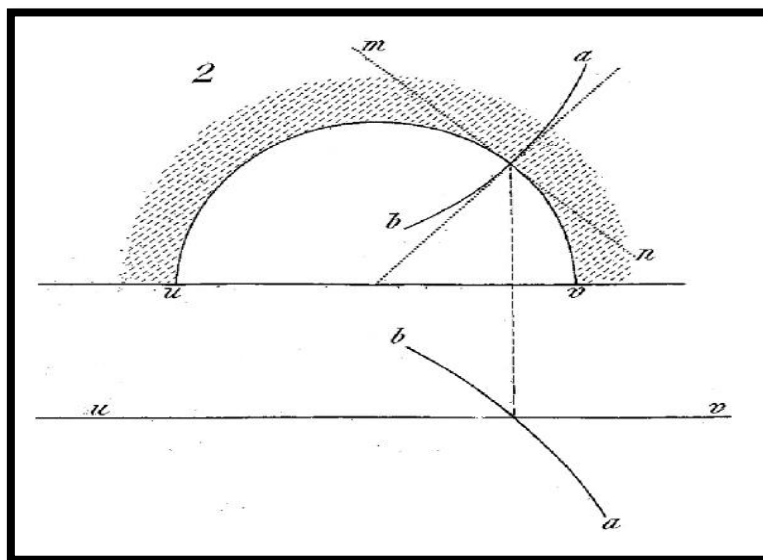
J.A. Adhèmar. *Trait de la Coupe de pierre*. (Pl.66, Img2).
